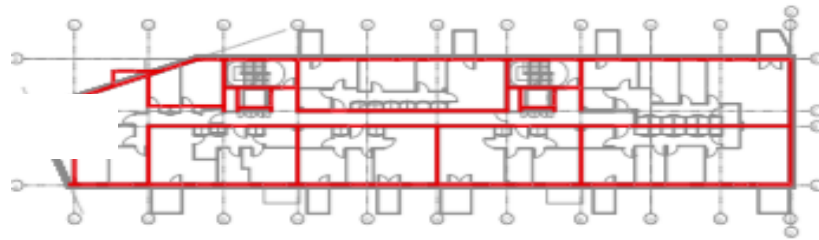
Upper Floor Layouts © EURBAN Ltd.
